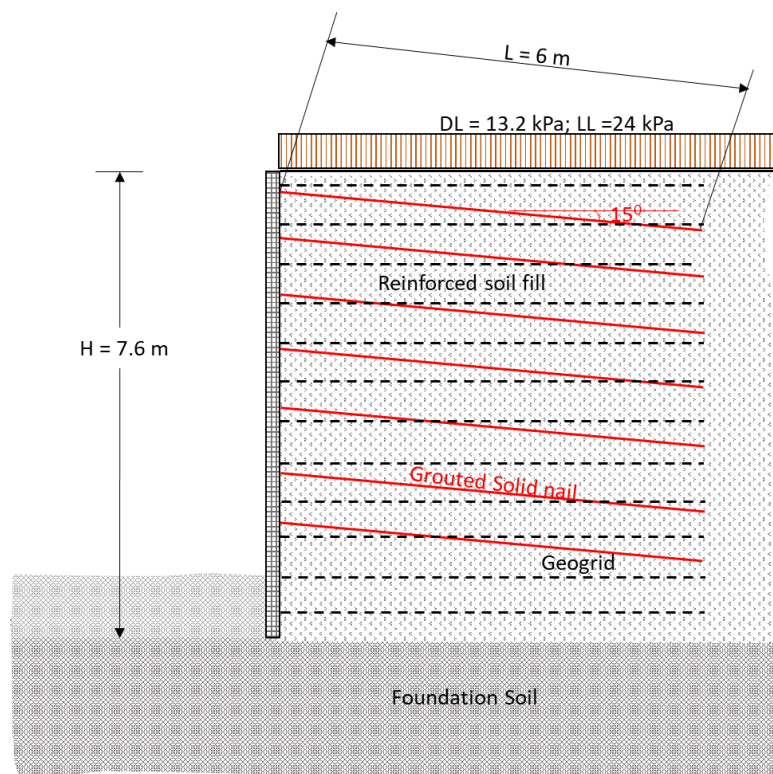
Figure IIA Schematic of GRS wall with grouted soil nail system depicting geometry
